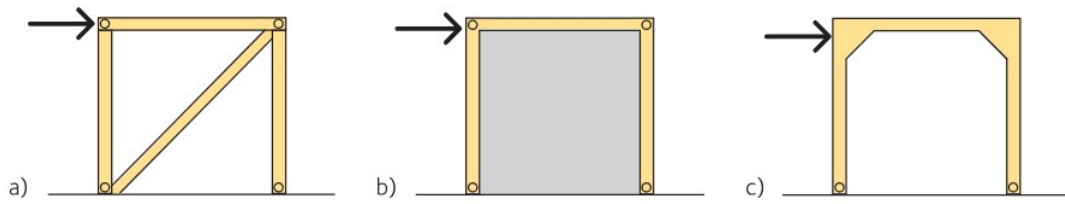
Alternatives of stabilization a) diagonal bracing b) shear wall and c) rigid frame connection. Copyright 2022 by Swedish Wood.
